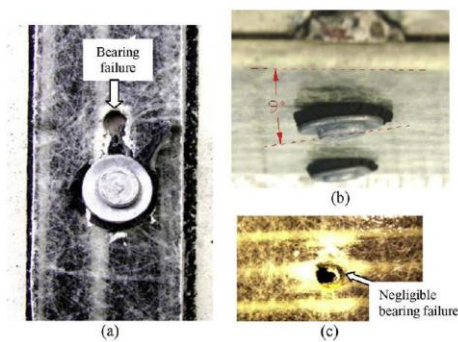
Nail and FRP interaction: a) extensive bearing failure (NES single shear test), b) nail rotation after flexure test, c) limited bearing failure after flexure test [21]
